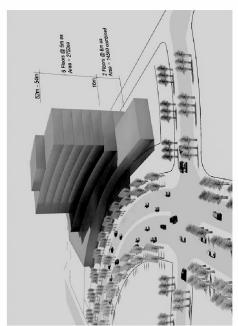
Initial TWC Massing Concepts - final design to be developed by Infrastructure Ontario
